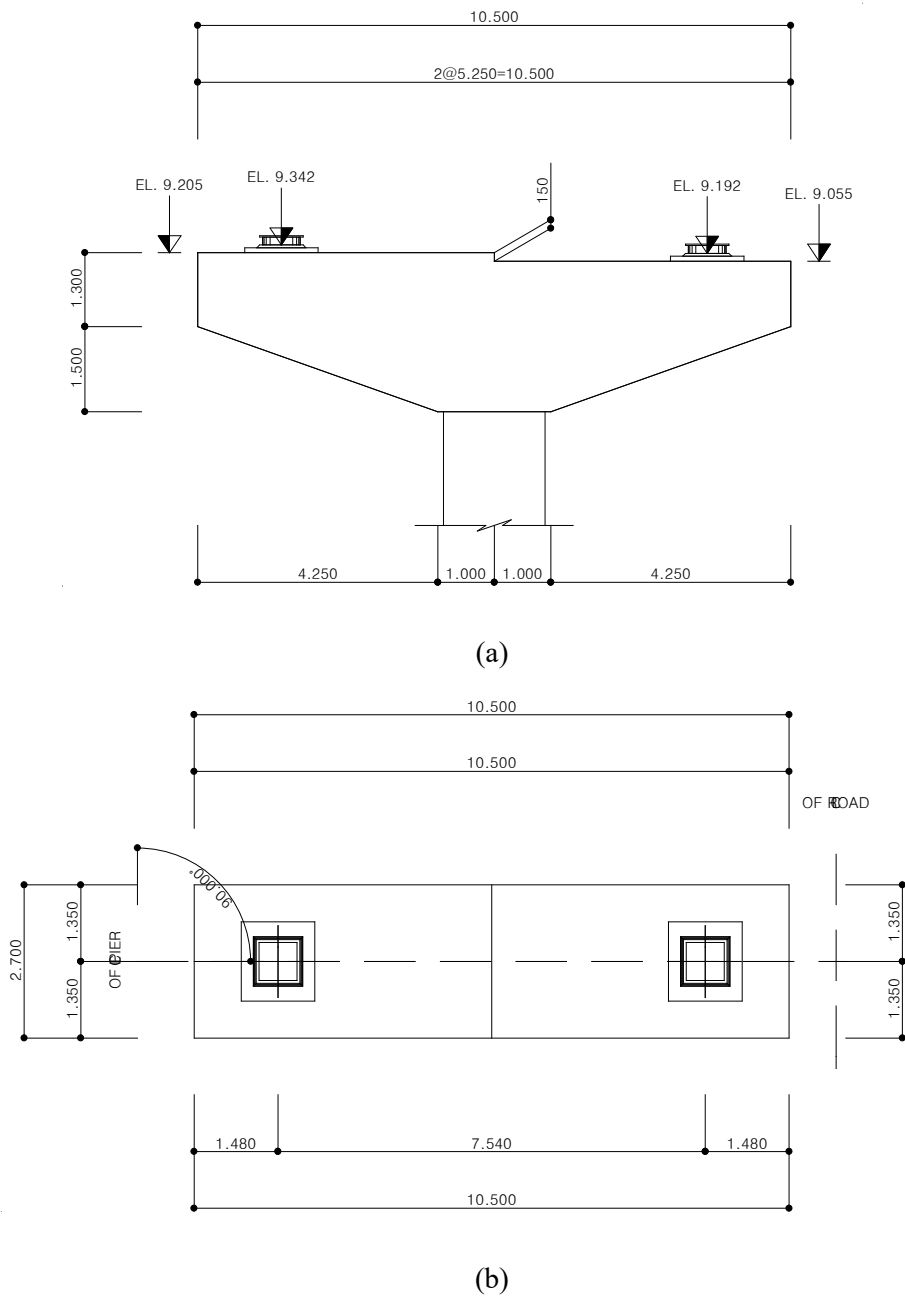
Design drawing of bridge number 7: (a) A front view; (b) A plane view
